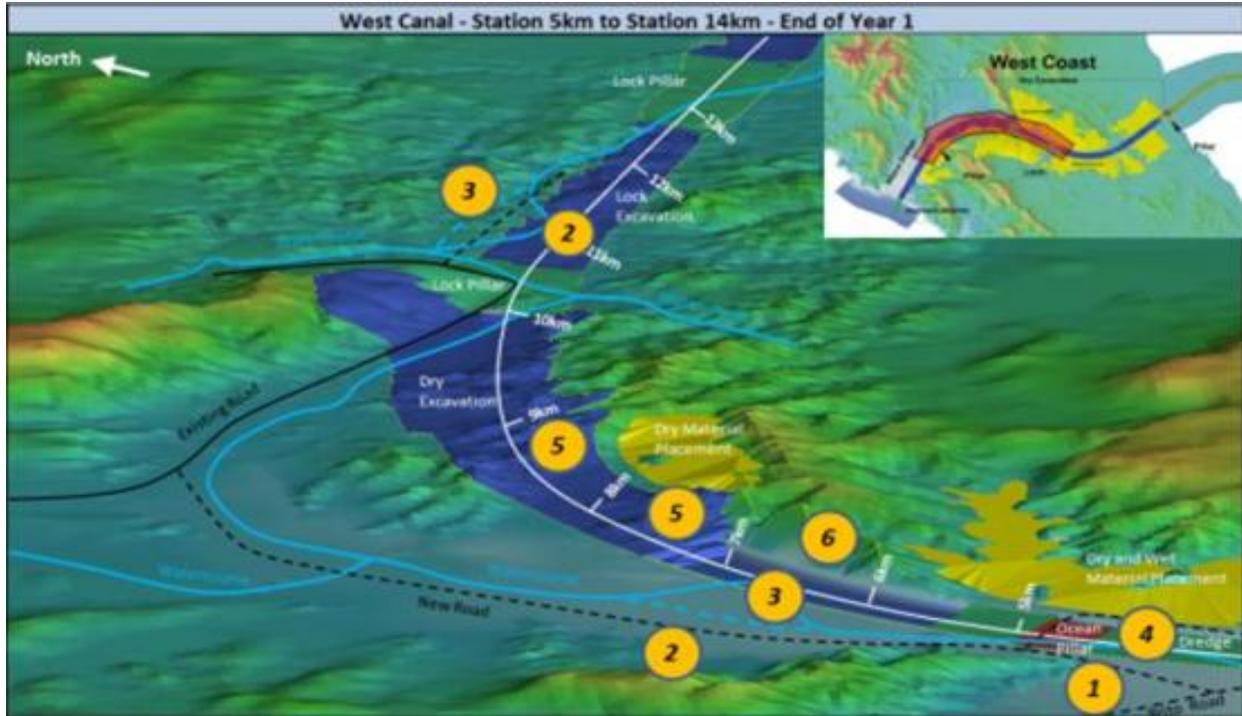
Year 1 West Canal Dry (Skim) Excavation
